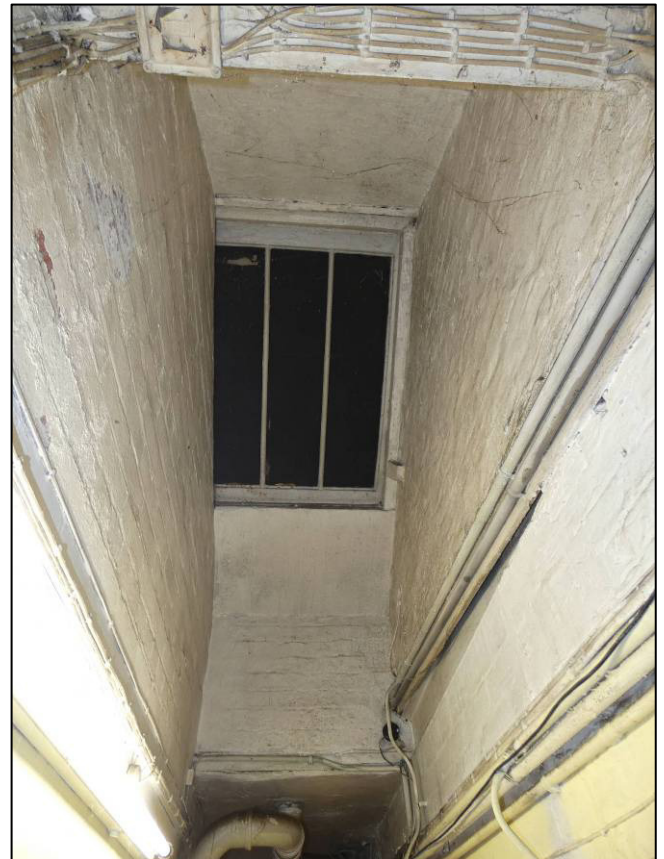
Passage GF3, south part, roof and skylight over, looking NW (photo 1/843).
